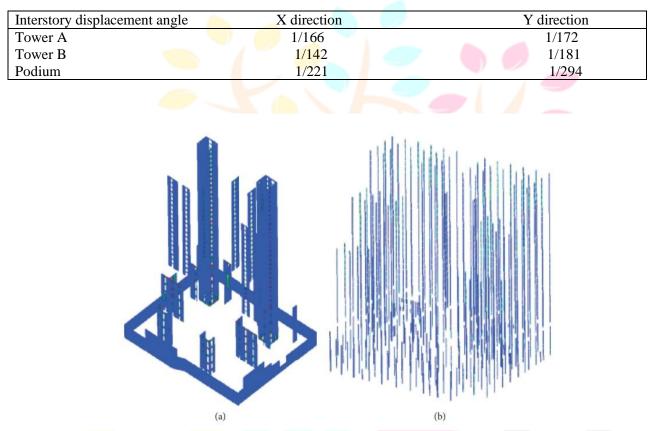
Damage of shear walls and frame columns under artificial wave y direction earthquake (a) overall damage of shear wall . (b) Damage of frame column.
